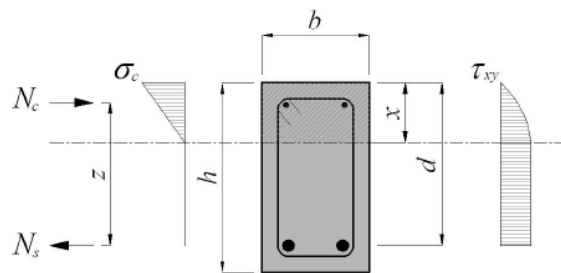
5 - Normal and shear stresses over the depth of cracked reinforced concrete beam (WALT 1999)
